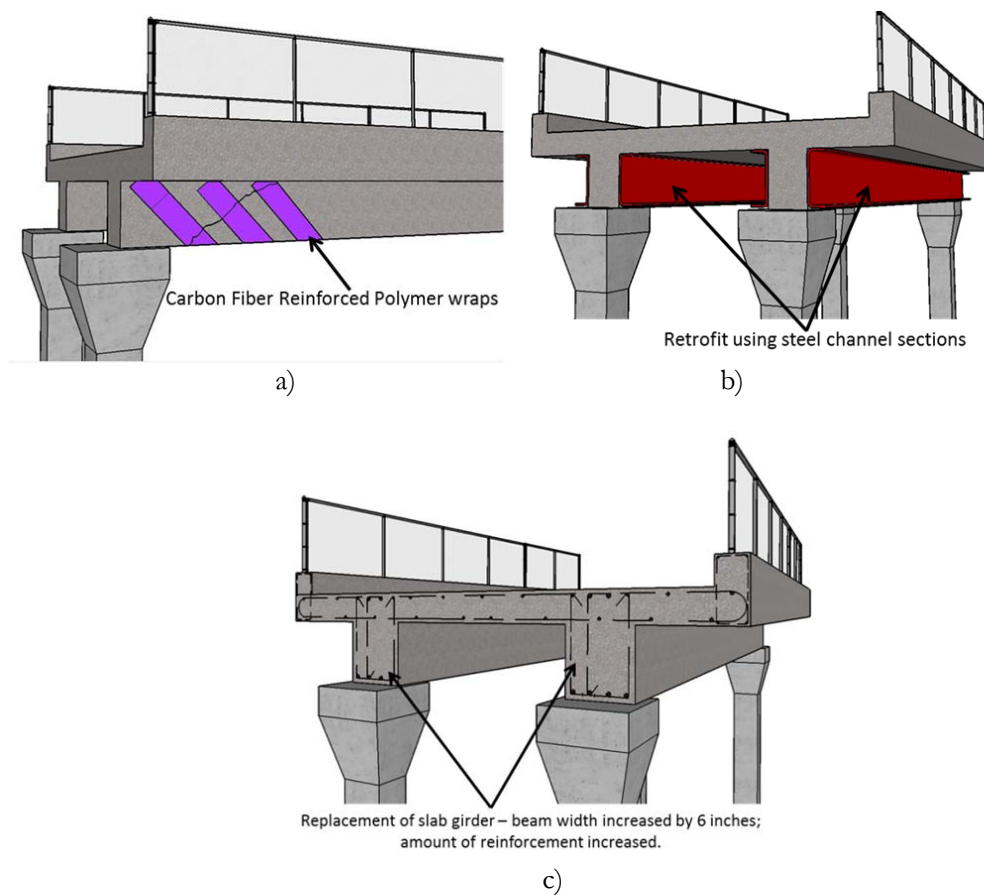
Retrofit Options, a) CFRP wrap, b) Steel C-Channel installation, c) Slab-girder replacement
